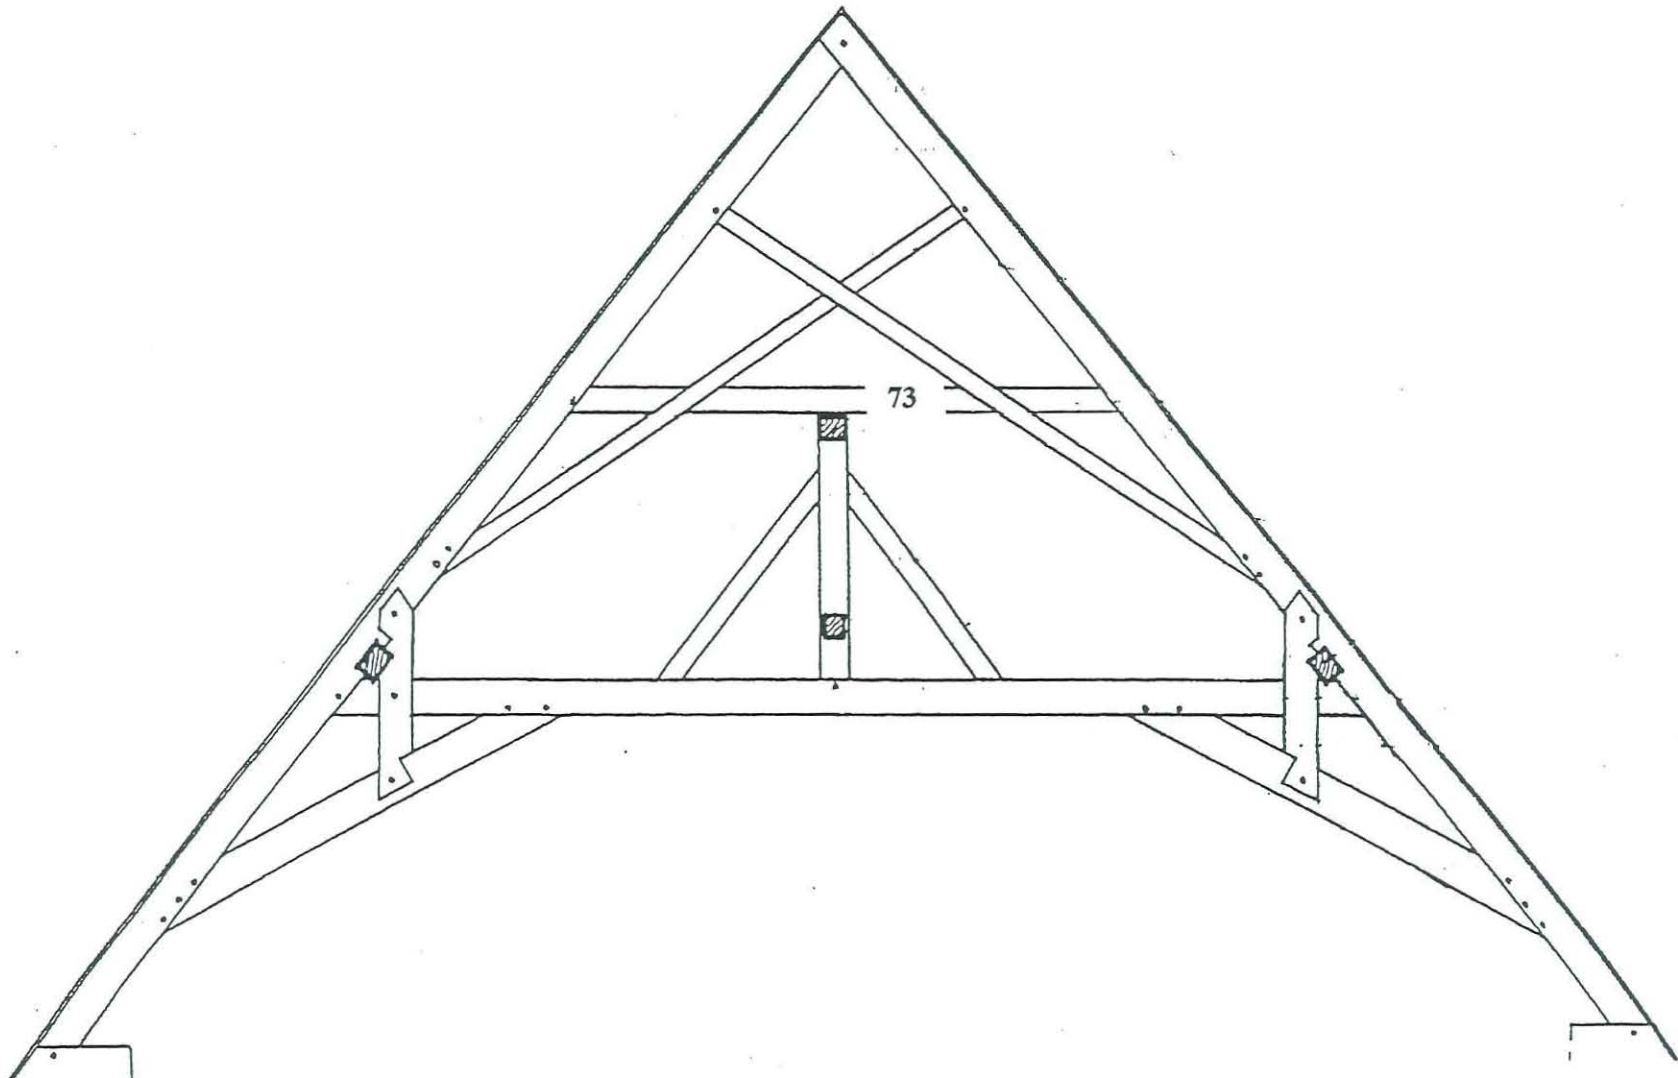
Drawing of frame 44 of the Choir and crossing, viewed from the east, to show sample locations
